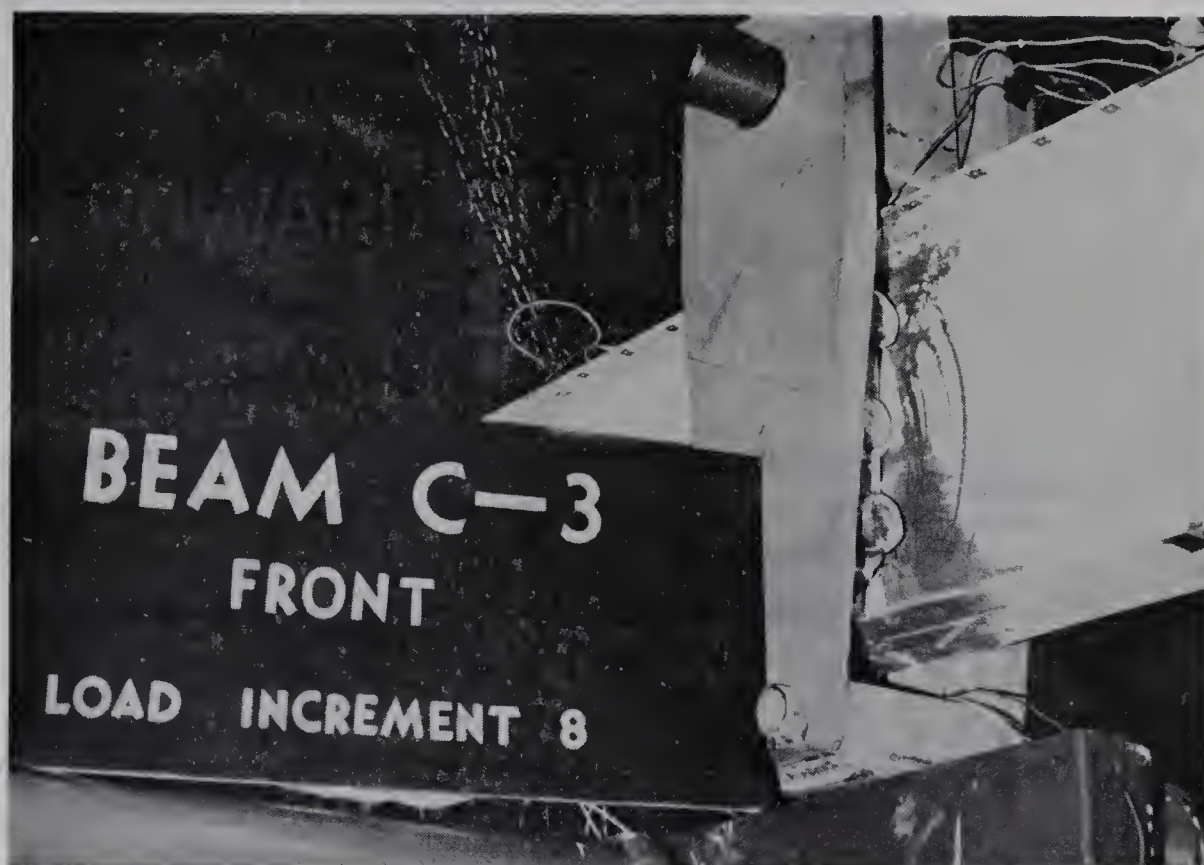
LOADING BOX ATTACHMENT TO BEAM
